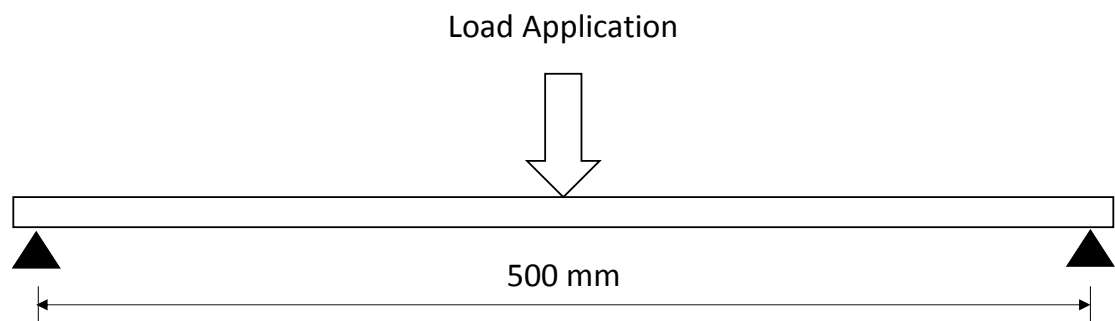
Loading configuration for non-destructive bending tests on slabs
